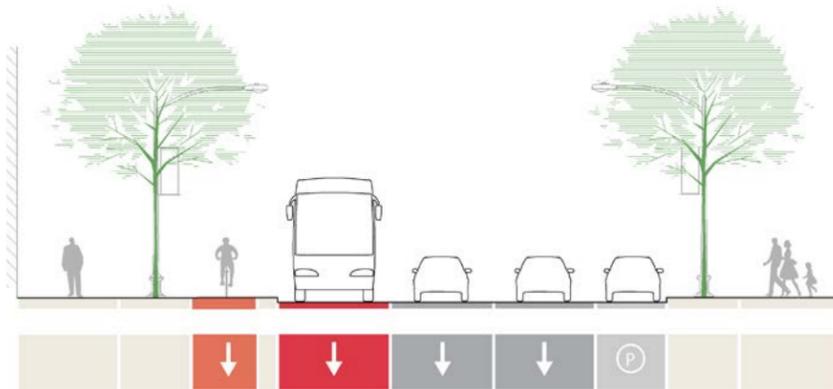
Fifth Street typical section Bowie Street to Guadalupe Street
